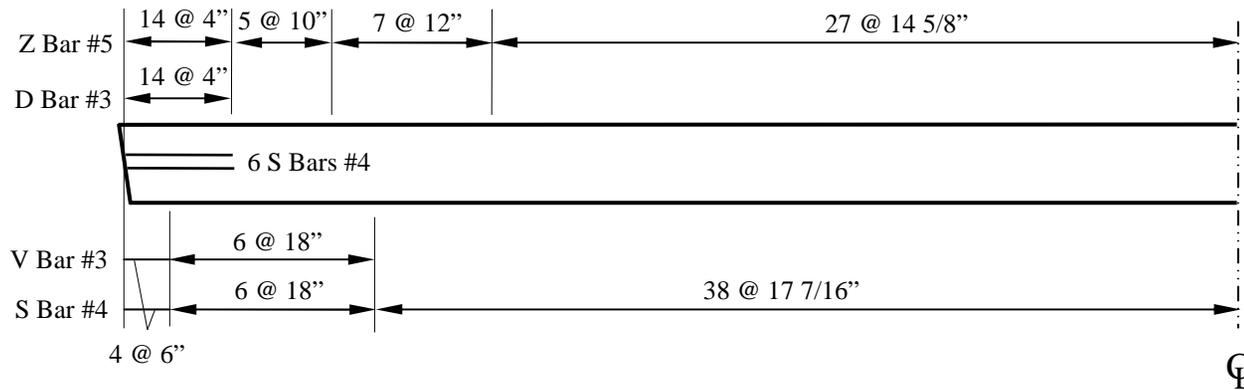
Mild Steel Spacing in BT-54 Girders
